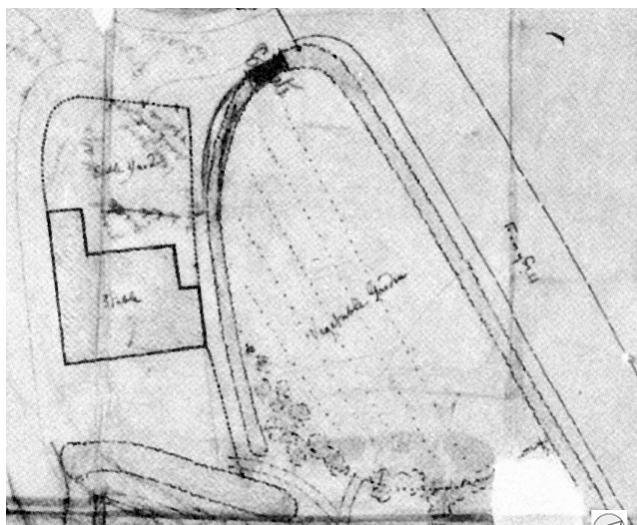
Detail of a 1904 plan of the grounds showing plan of cutting garden hedge following relocation of vegetable garden. Note lack of opening/passage through south end of hedge on north (left) side and continuation of fence line to the kitchen hedge (Saint-Gaudens National Historic Site).
